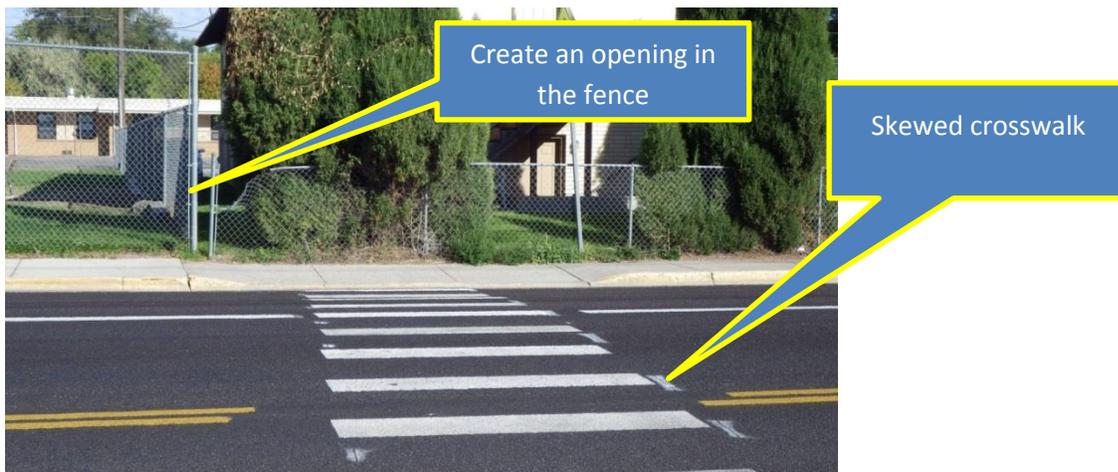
Crosswalk on Jefferson Ave. at elementary school
